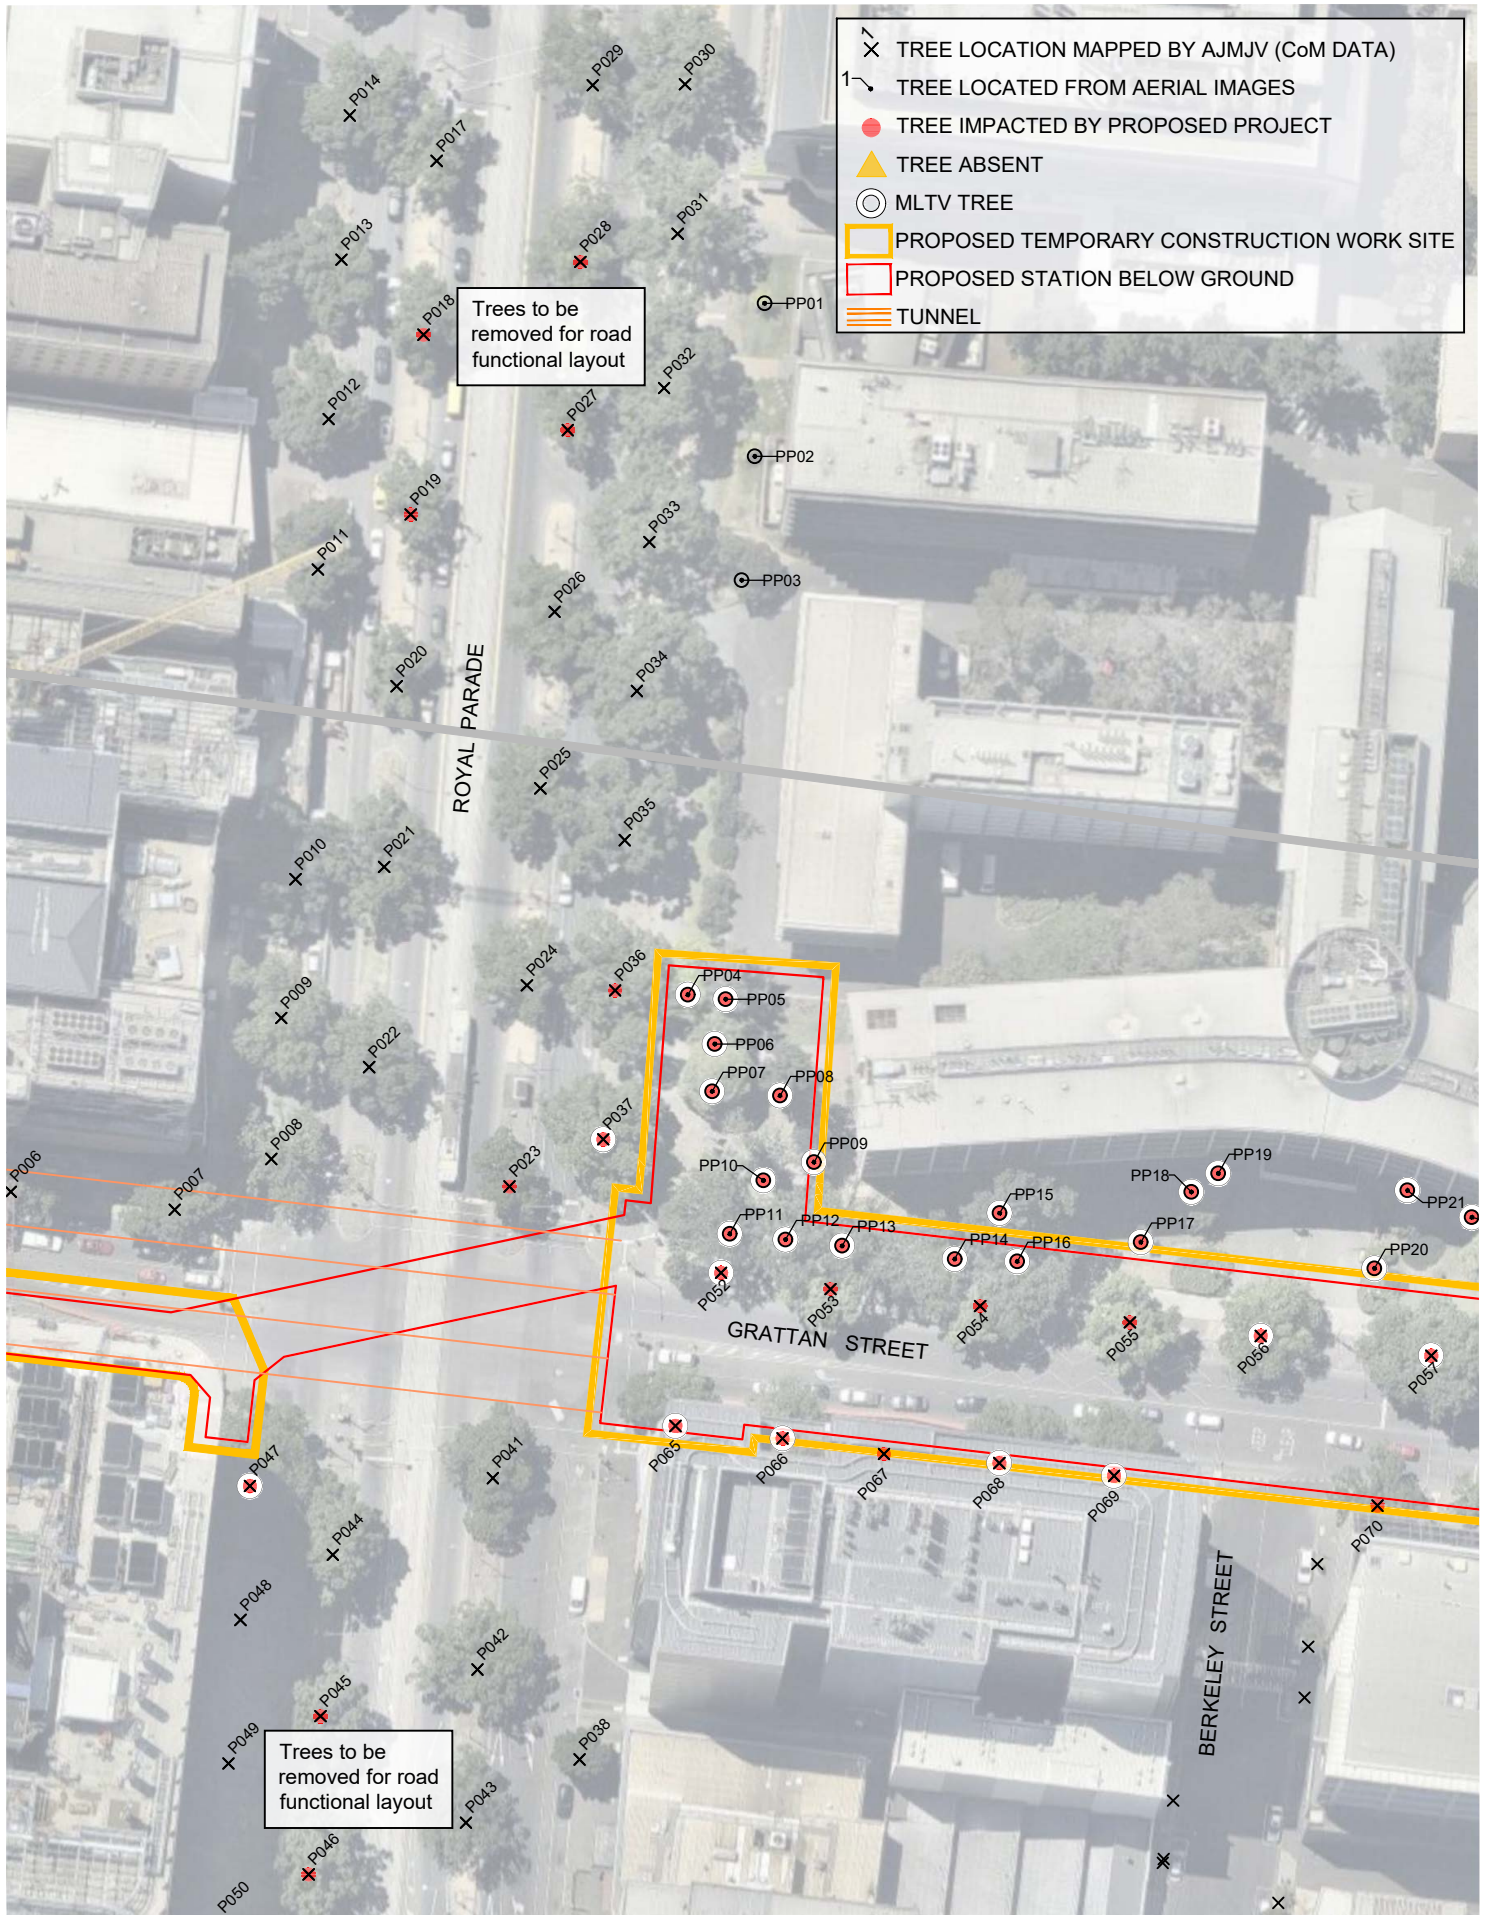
KEY PLAN – POTENTIALLY IMPACTED TREES, PARKVILLE
